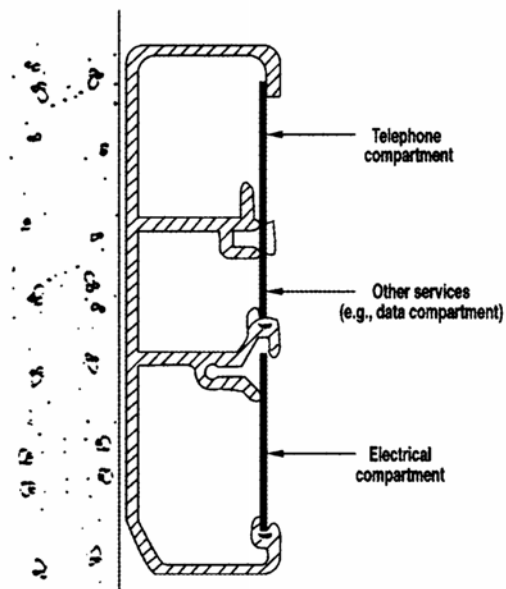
PERIMETER RACEWAYS LINKED TO UNDERFLOOR DUCT DISTRIBUTION SYSTEM
